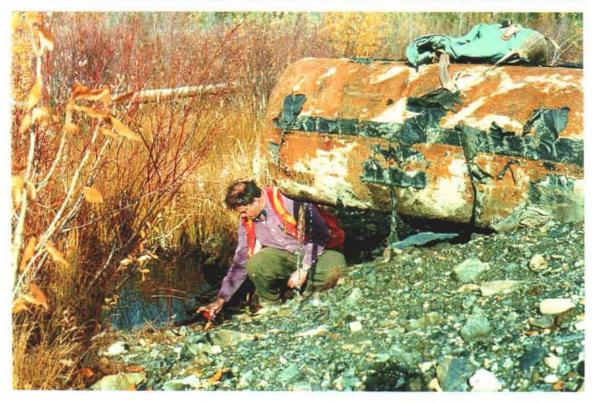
Pipe on downstream side of decant on Dam No. 3. This is also sampling site 79-WQ-02.
